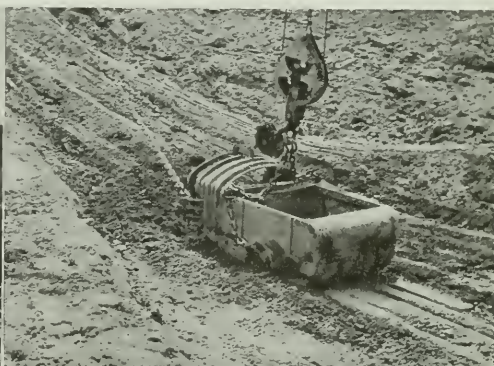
Drag Line Bucket at Work on Site of Lock No. 1.
